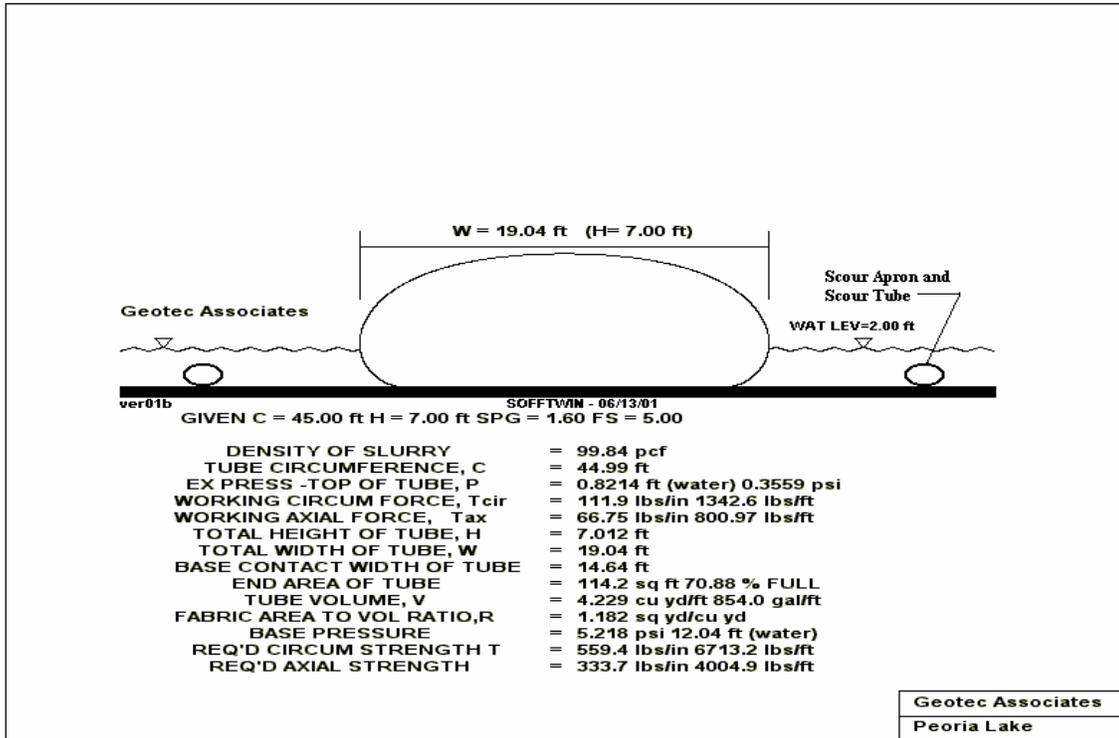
Geotextile container design (courtesy of Jack Fowler, Geotec Associates)
